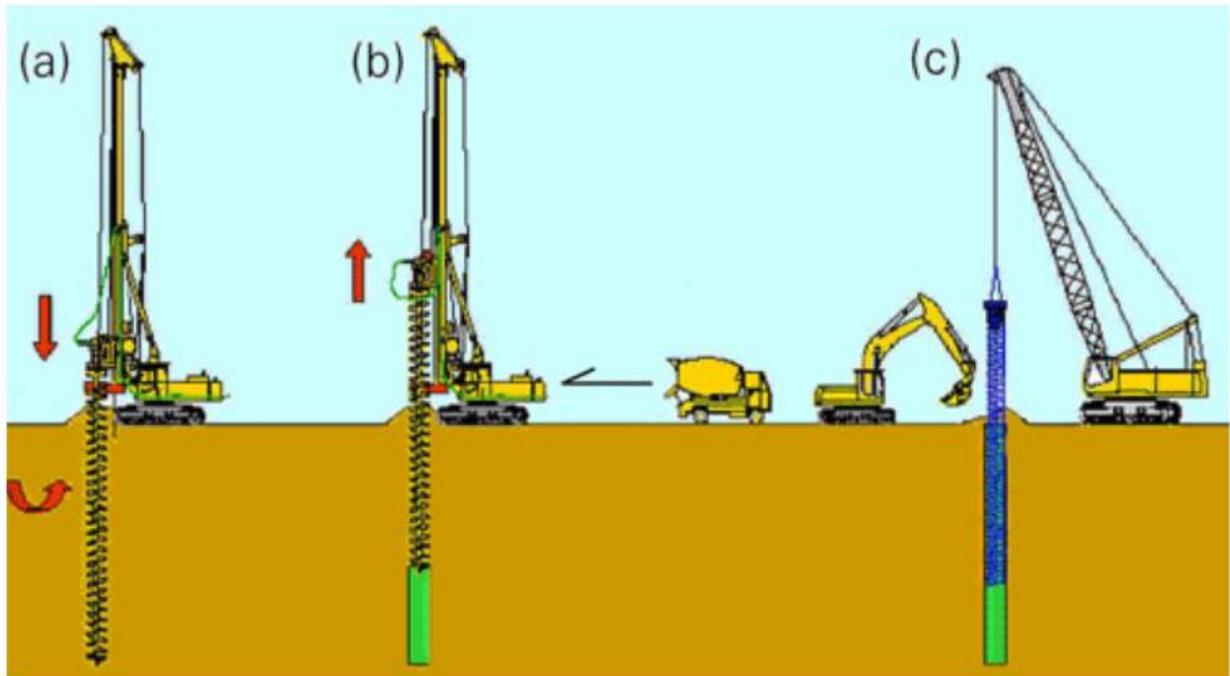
Continuous flight Auger pile as bridge foundation [1]
